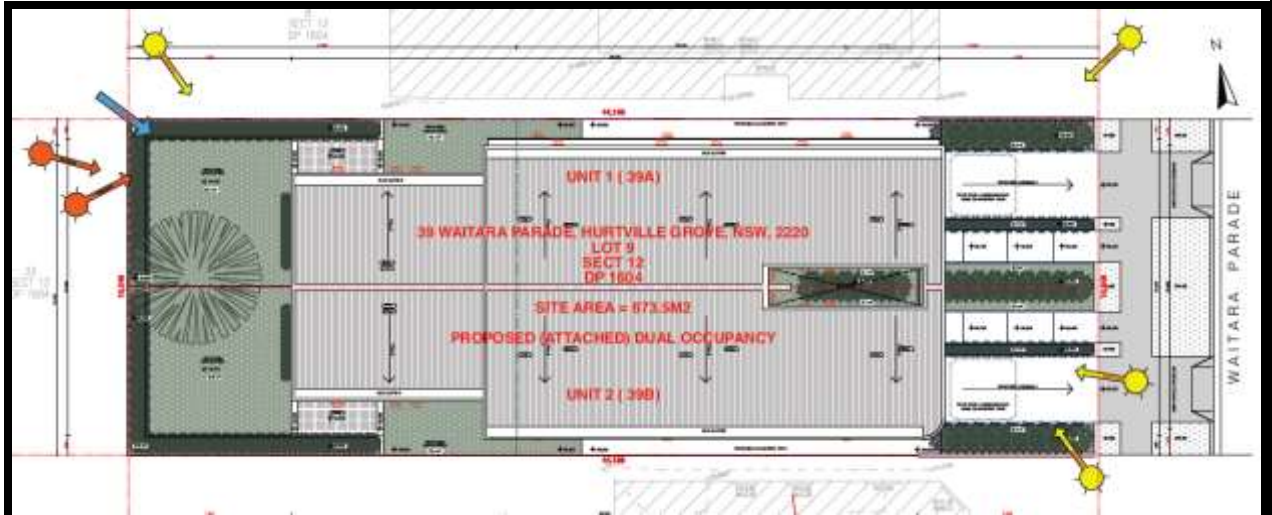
Site plan showing T1 to be retained and location of ground floor
